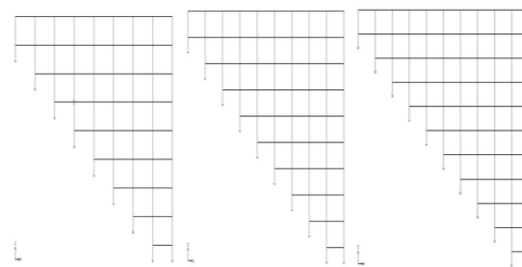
Step back frames of 8 storey, 9 storey and 10 storey buildings
